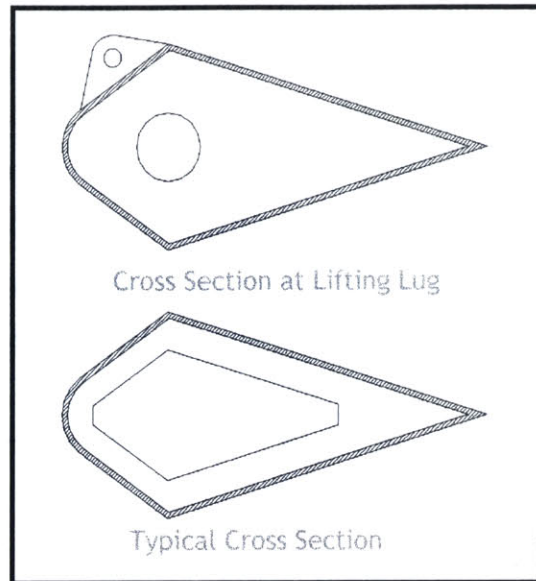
Cross section views of arch at the lifting lug and a typical cross section.
